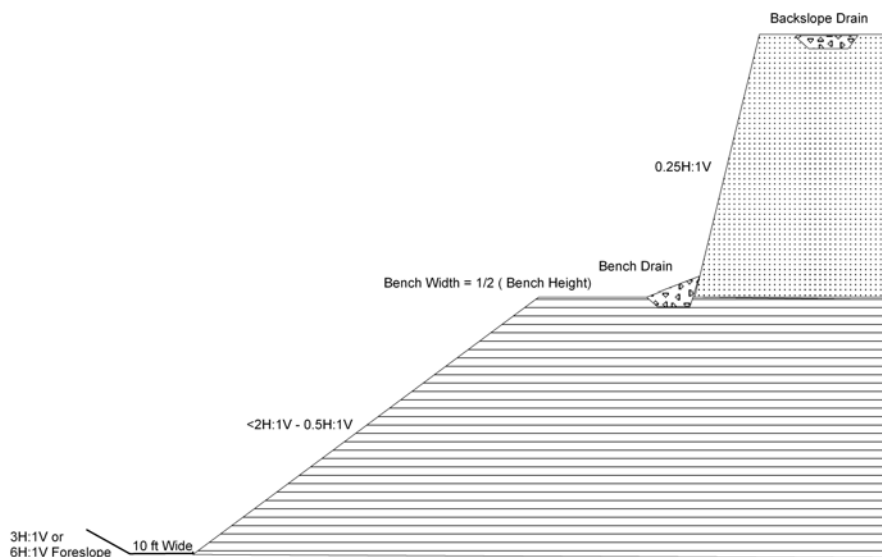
Recommended slope design for Type A stratigraphic configuration of inter-layered design units, option 2.
